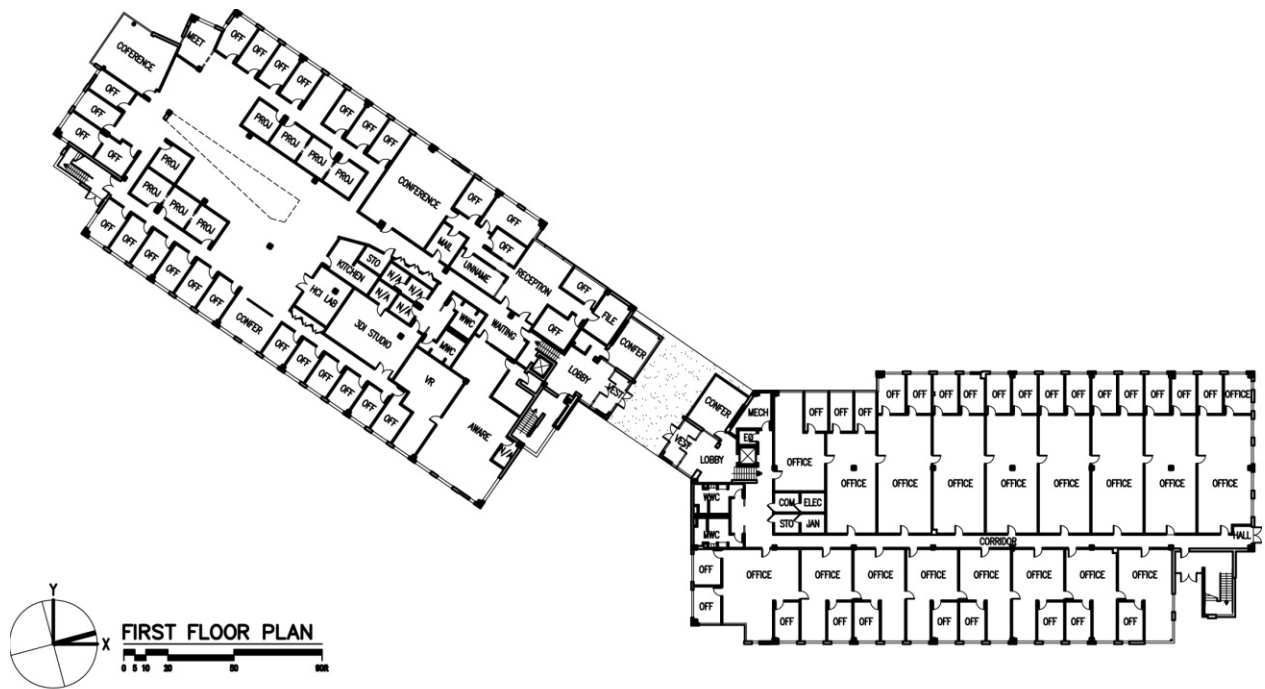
First floor plan of the KnowledgeWorks I & II buildings redrawn from the original drawing of SMBW Architects, P.C.
